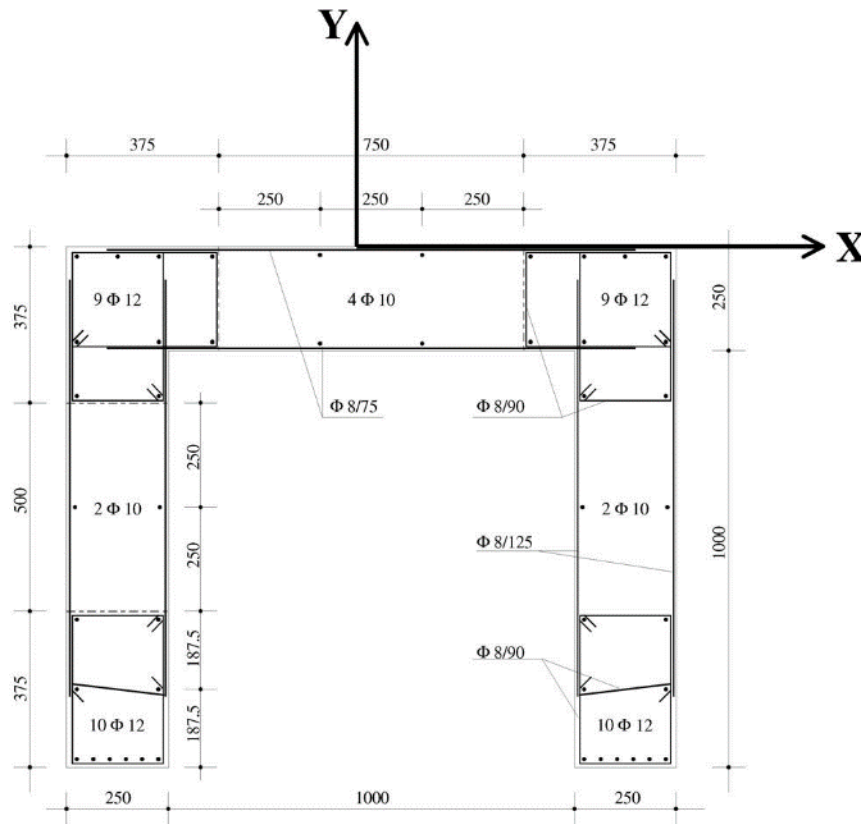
Test Specimen Reinforcement Details for Ile & Reynouard [101]
